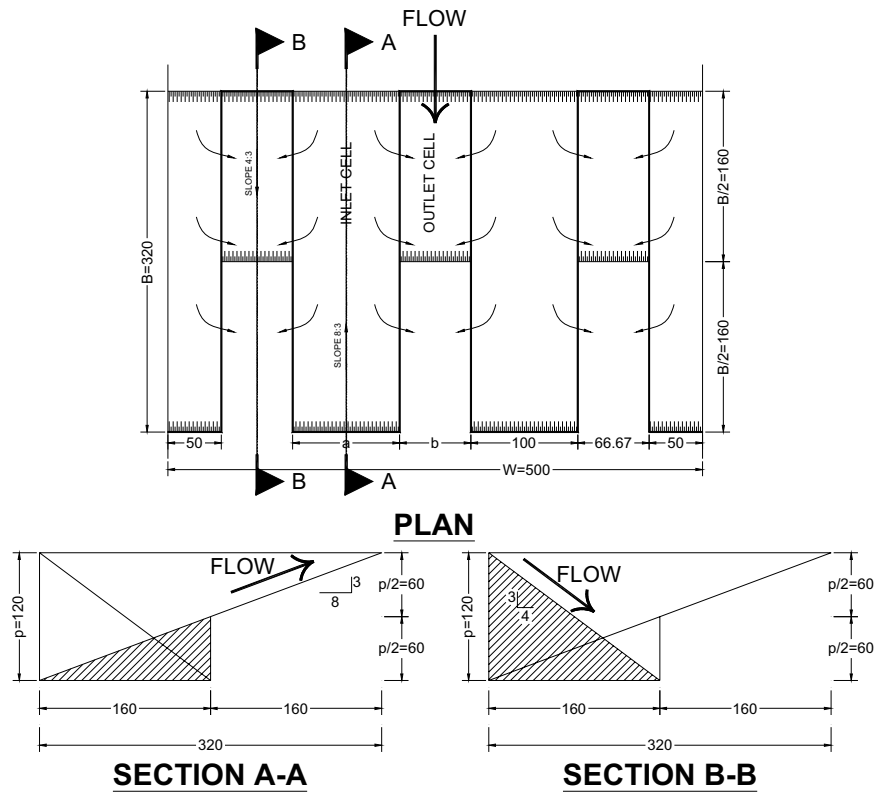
Plan and section of model P₄M₅ (both sides ramping), (dimensions in mm)
